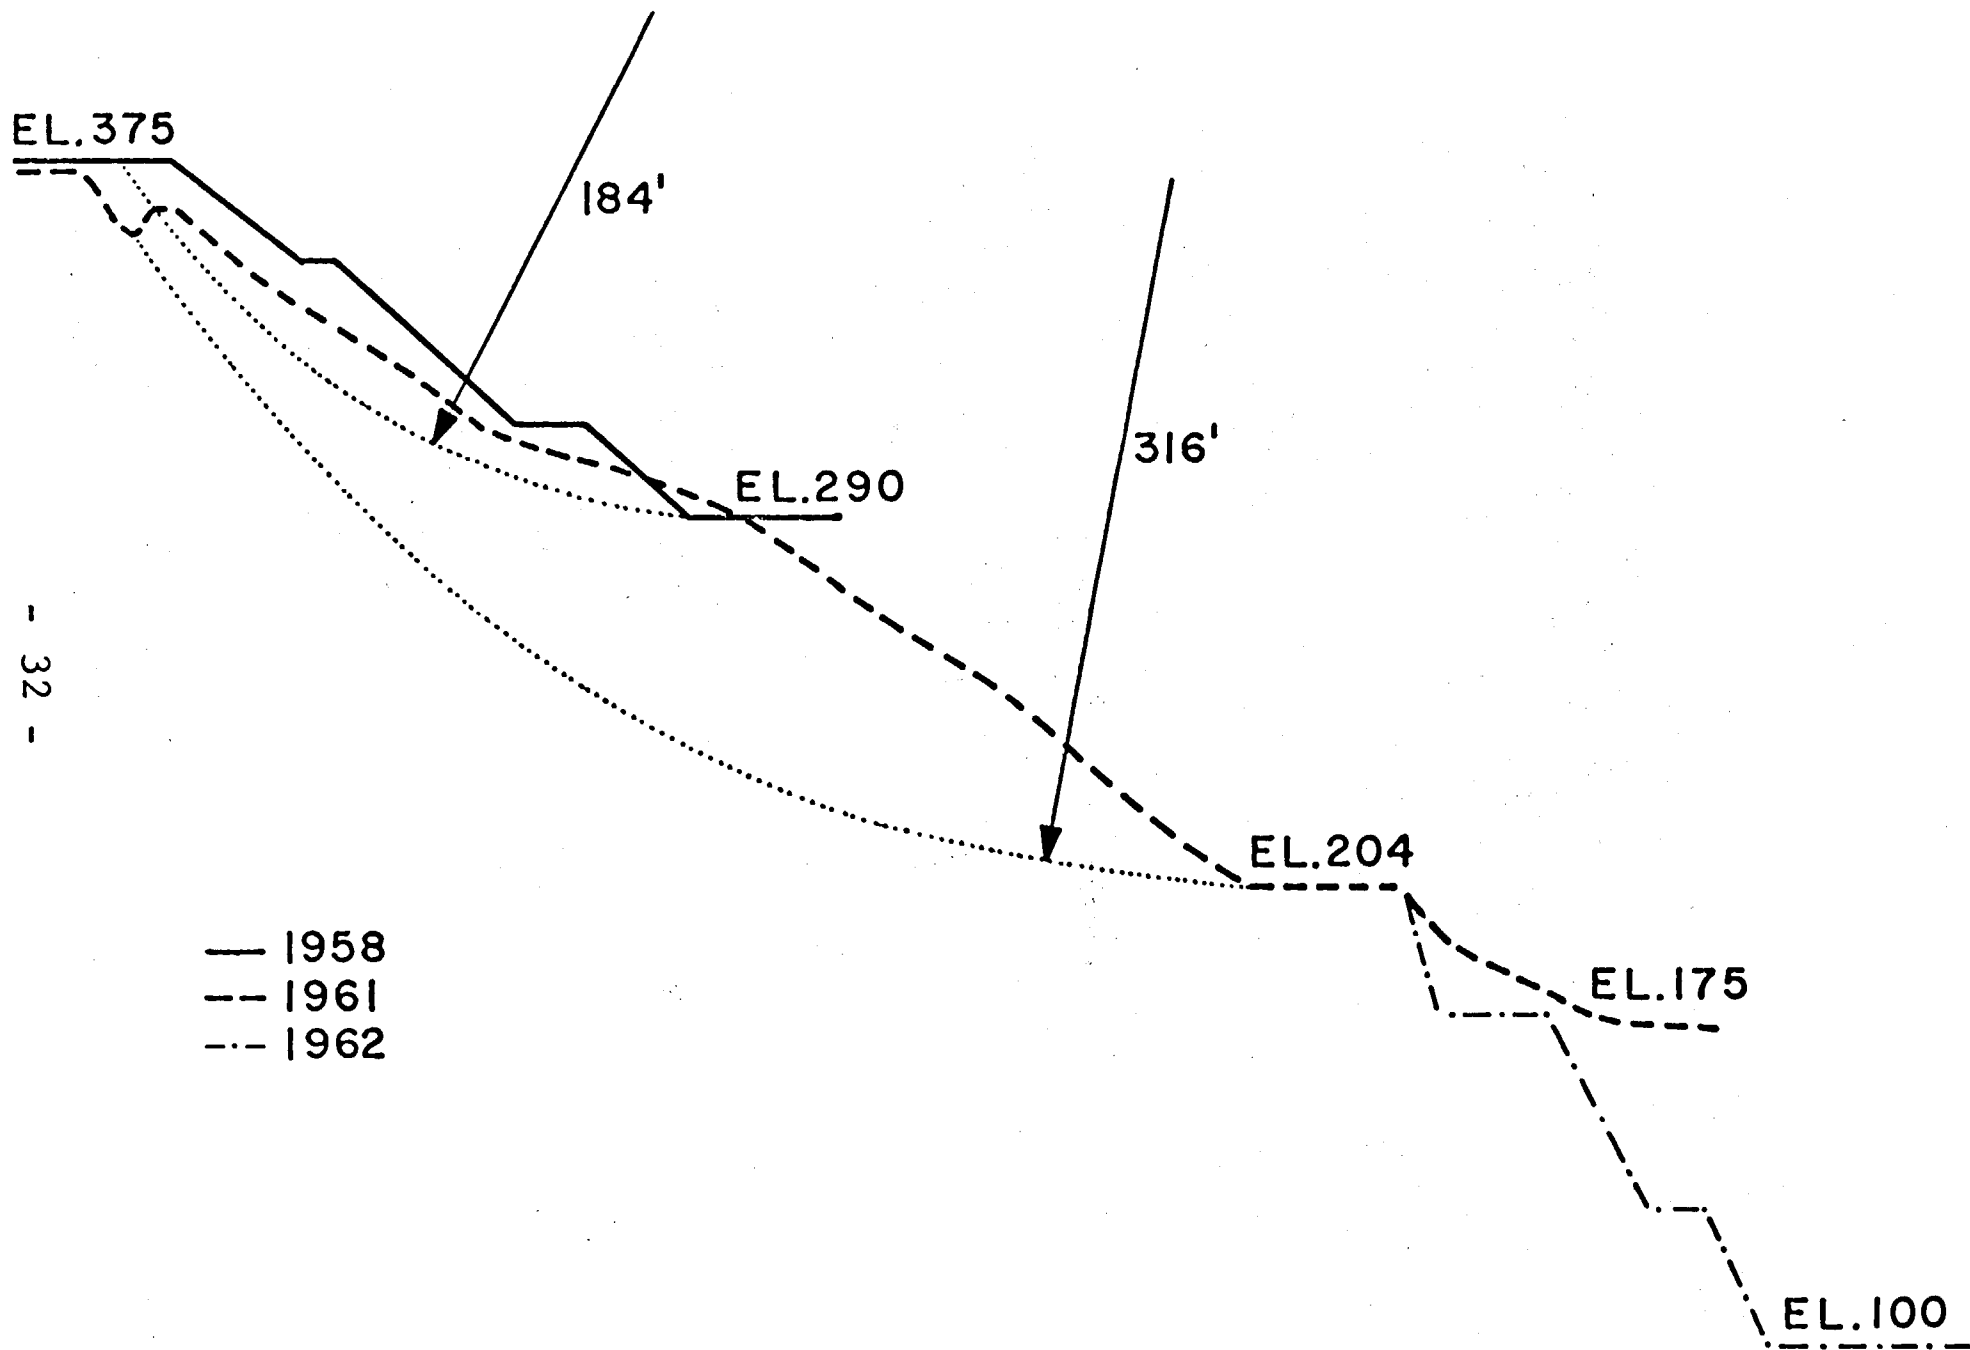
CROSS-SECTION OF A SLOPE WHERE FAILURES OCCURRED AS
